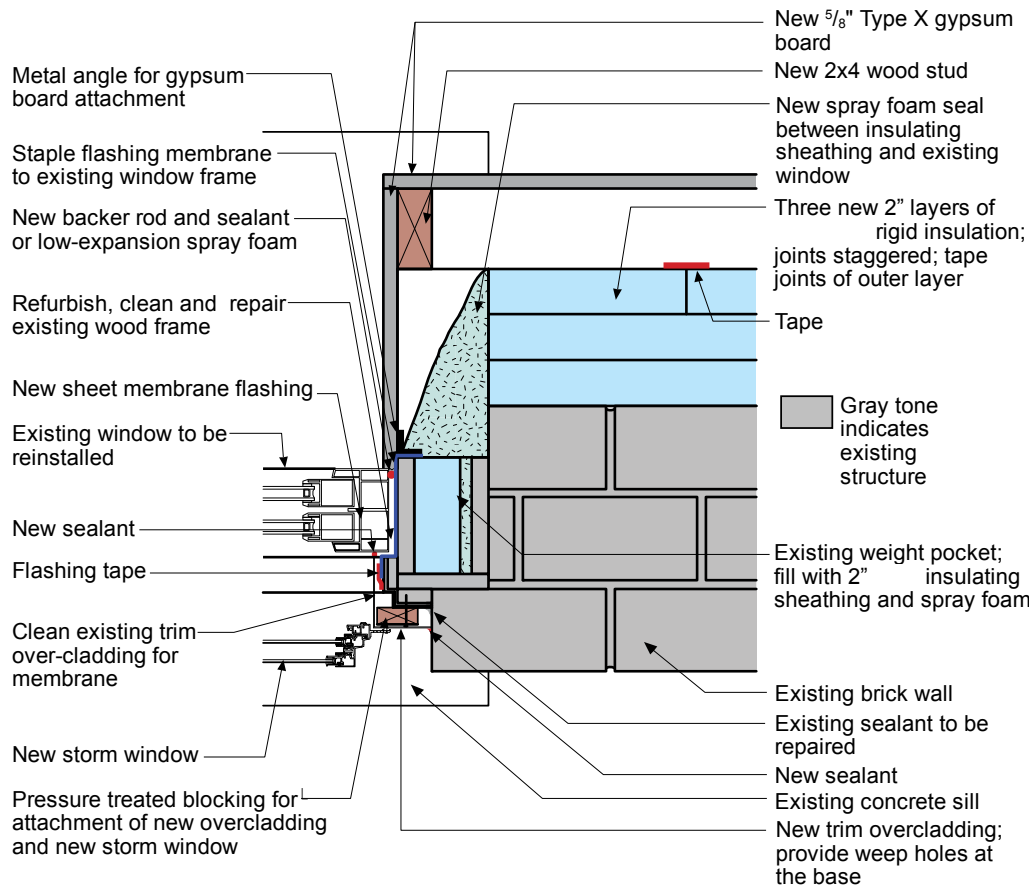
Window jamb retrofit detail, showing spray foam “fillet”
